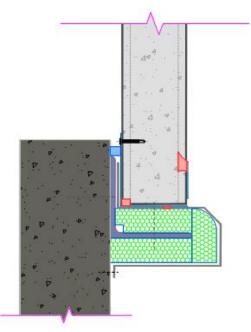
Base detail to wrapped steel angle – vertical and horizontal panel
